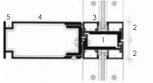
[above] Vertical section through the curtain wall at ceiling level
